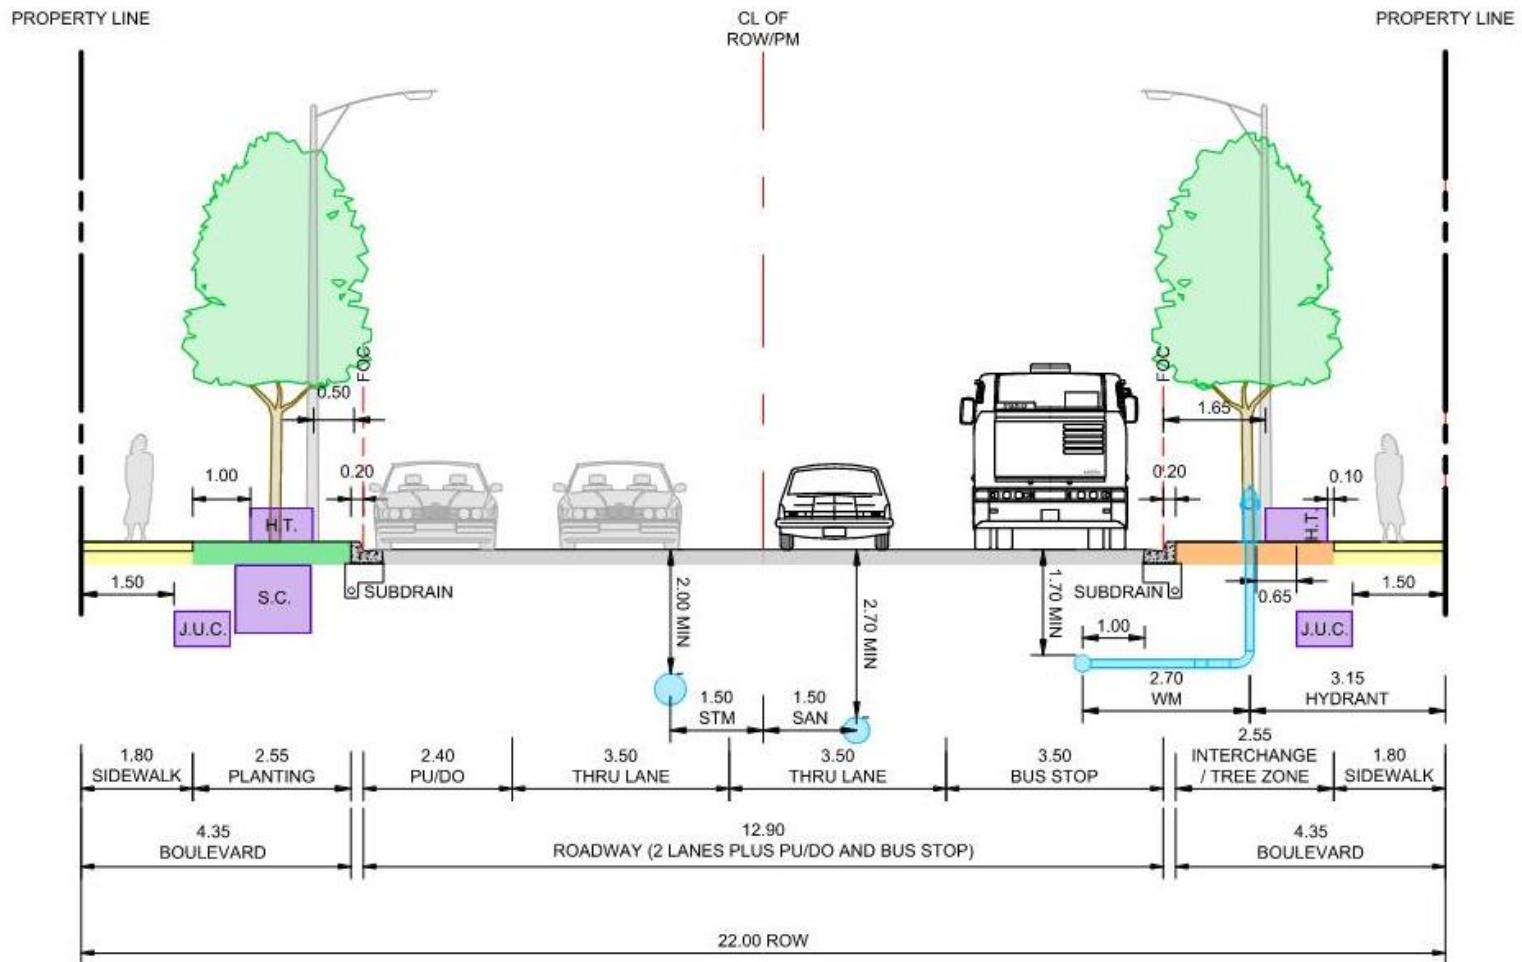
22 METRE CROSS-SECTION: TRANSIT MALL COLLECTOR ROAD
